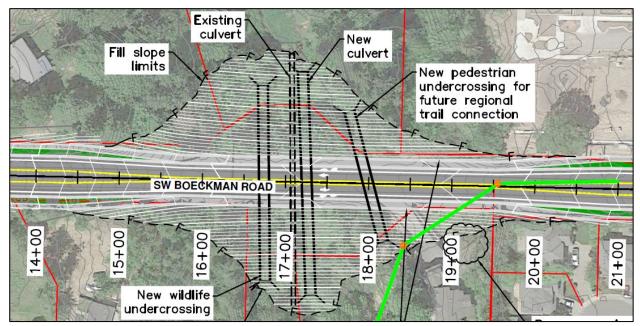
preliminary design of the embankment alternative, including culvert and tunnels
